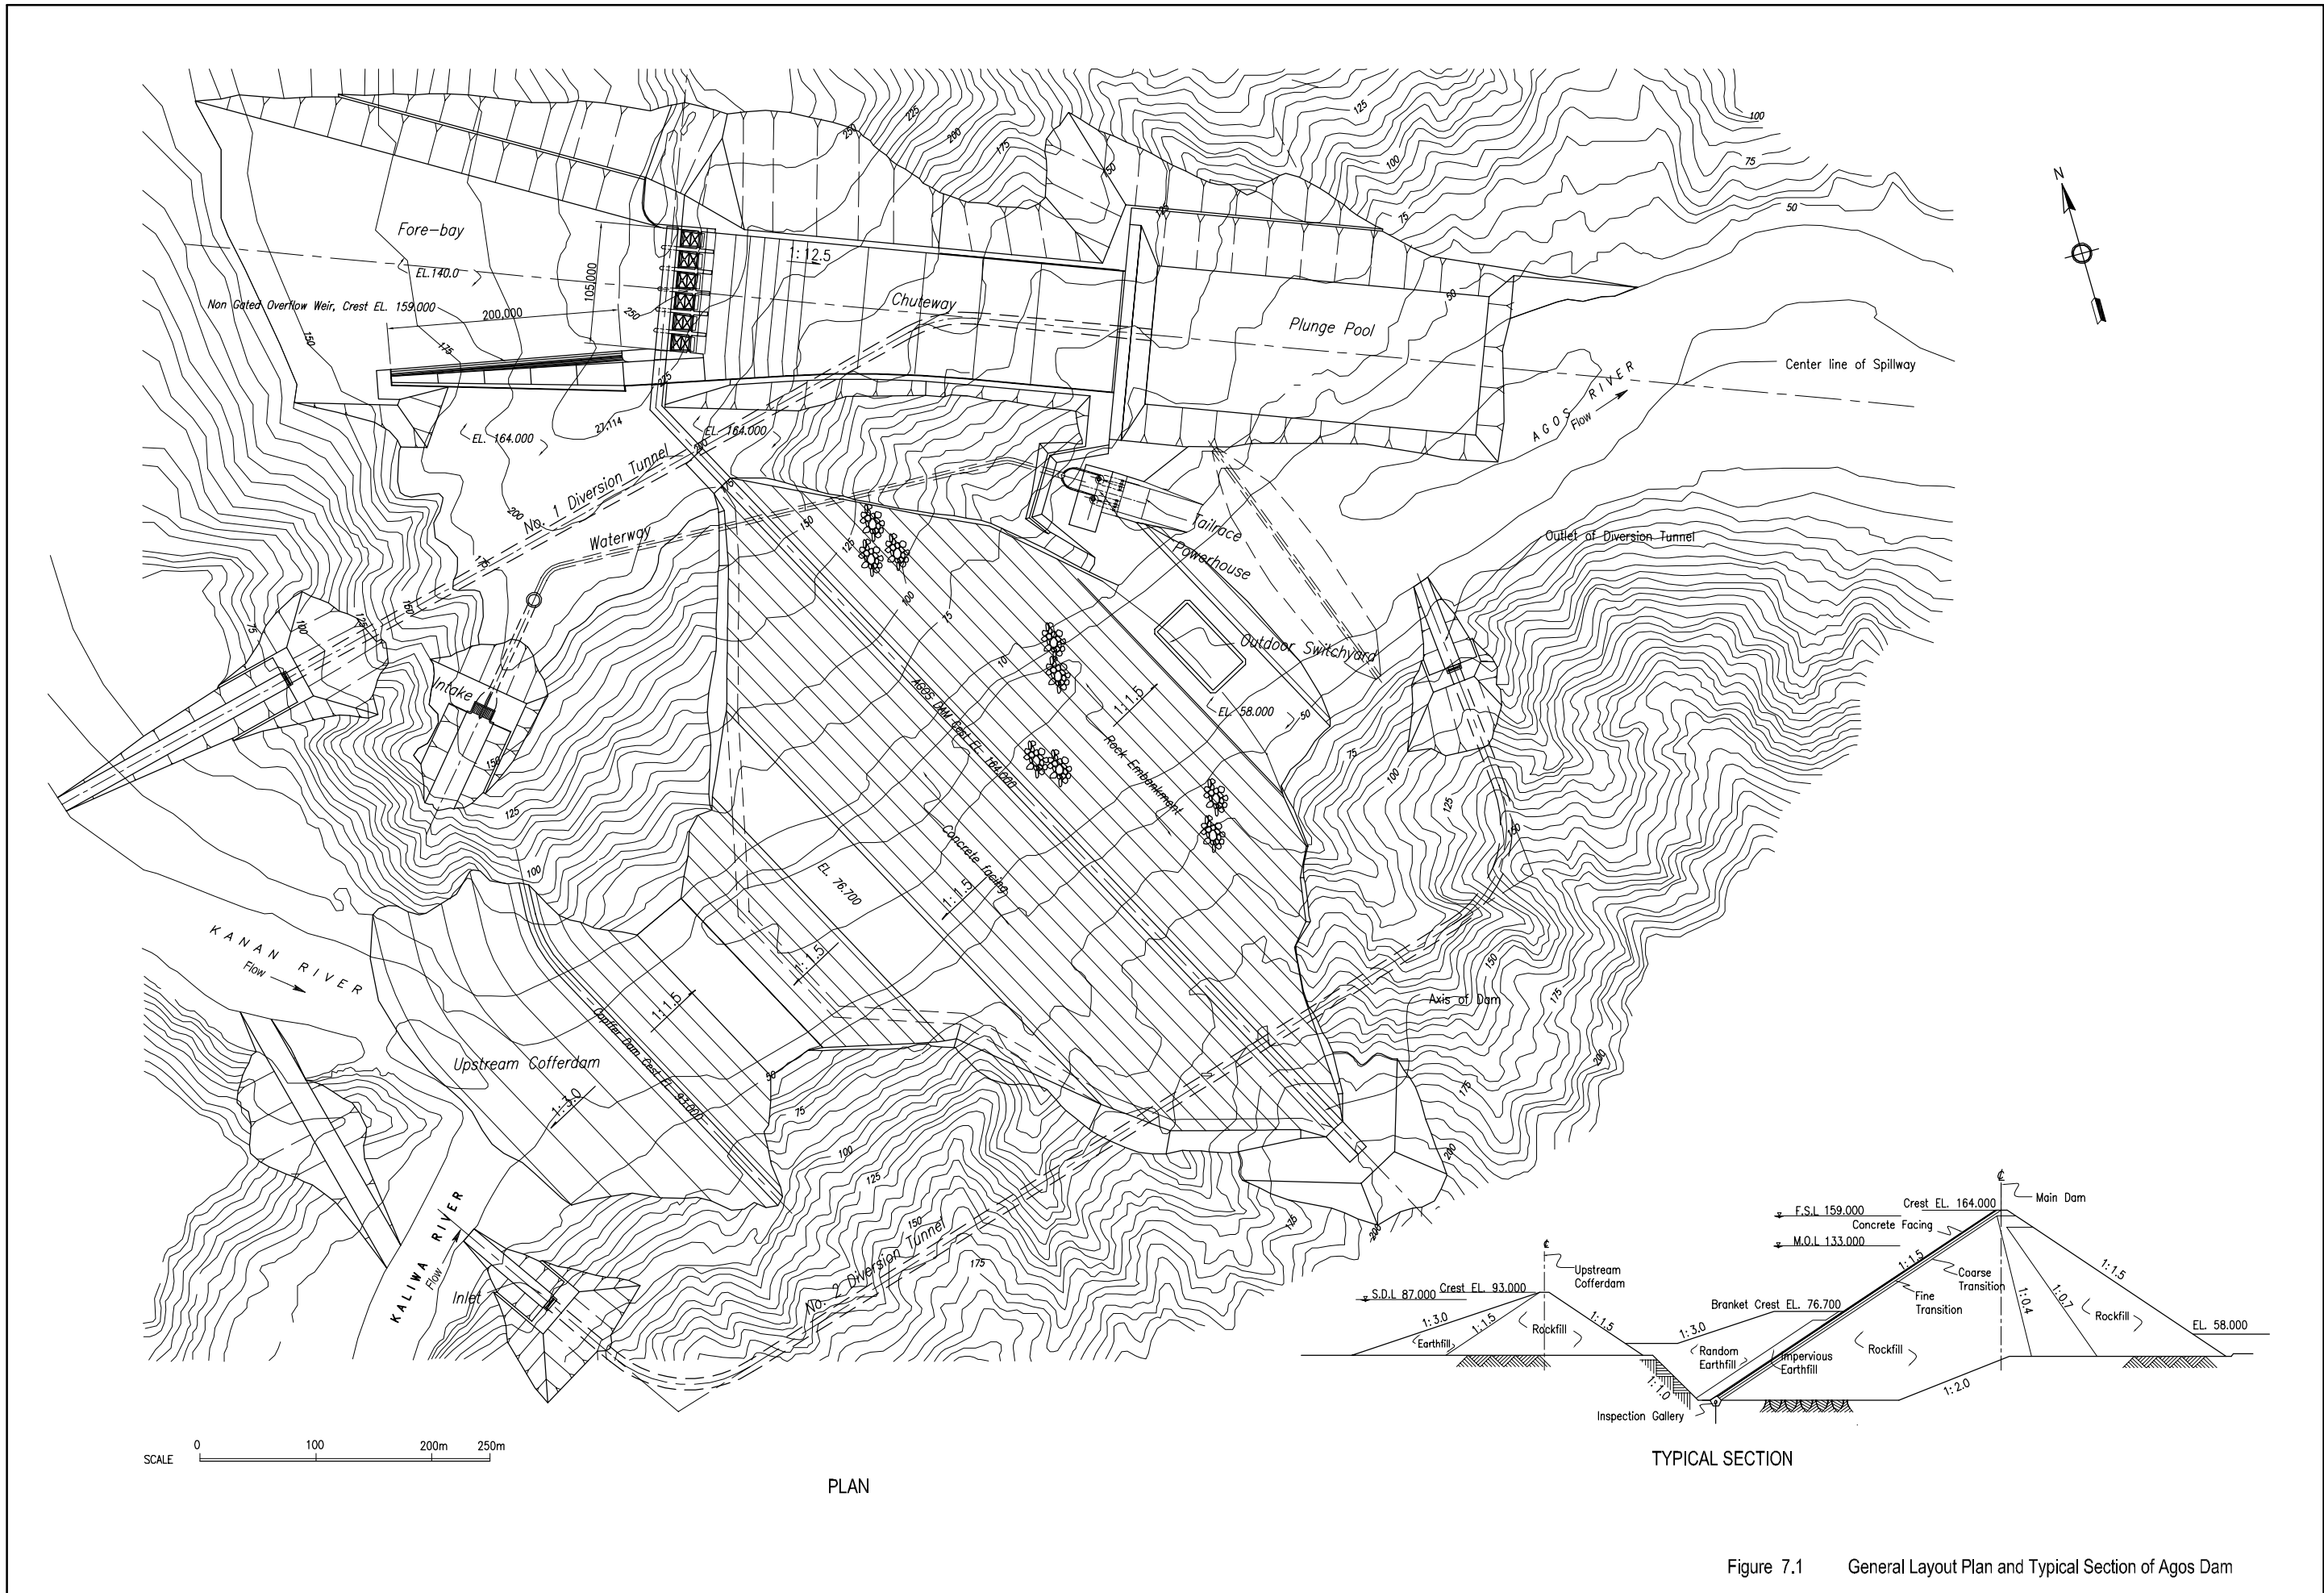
General Layout Plan and Typical Section of Agos Dam
